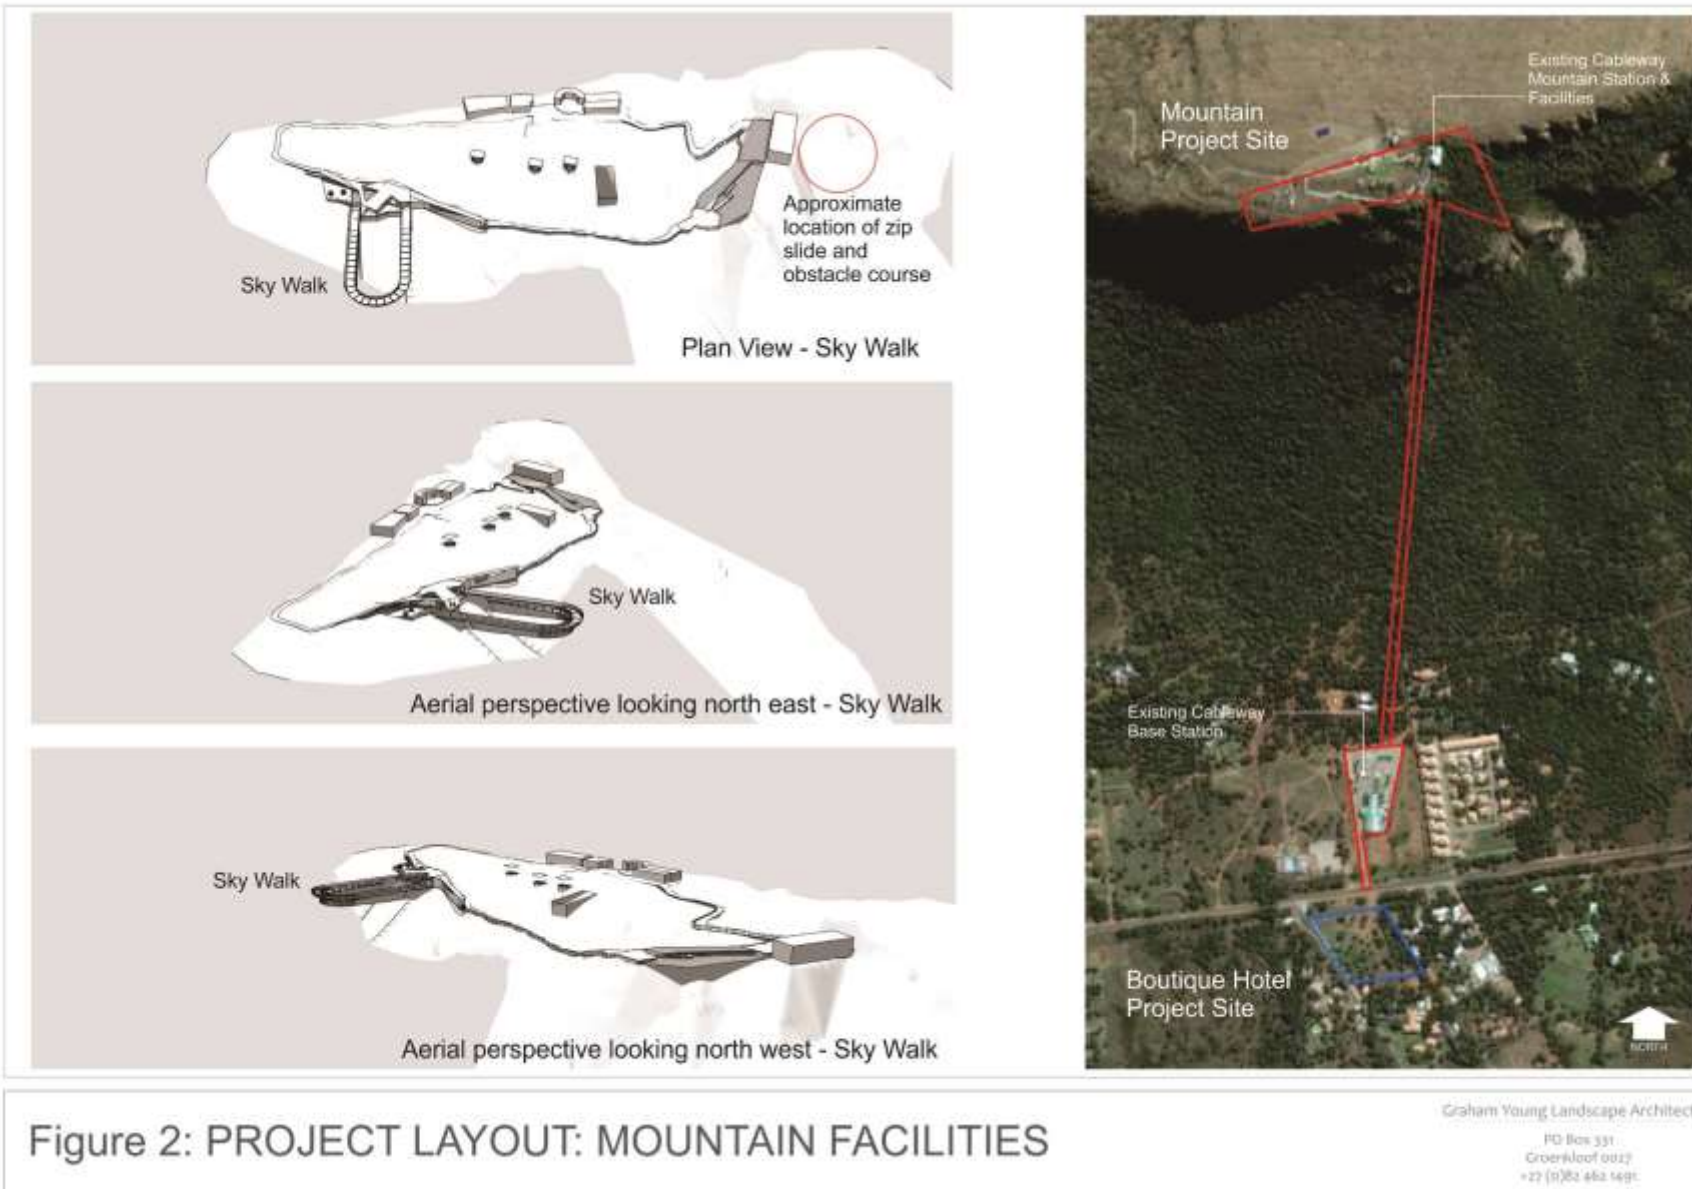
PROJECT LAYOUT: MOUNTAIN FACILITIES
